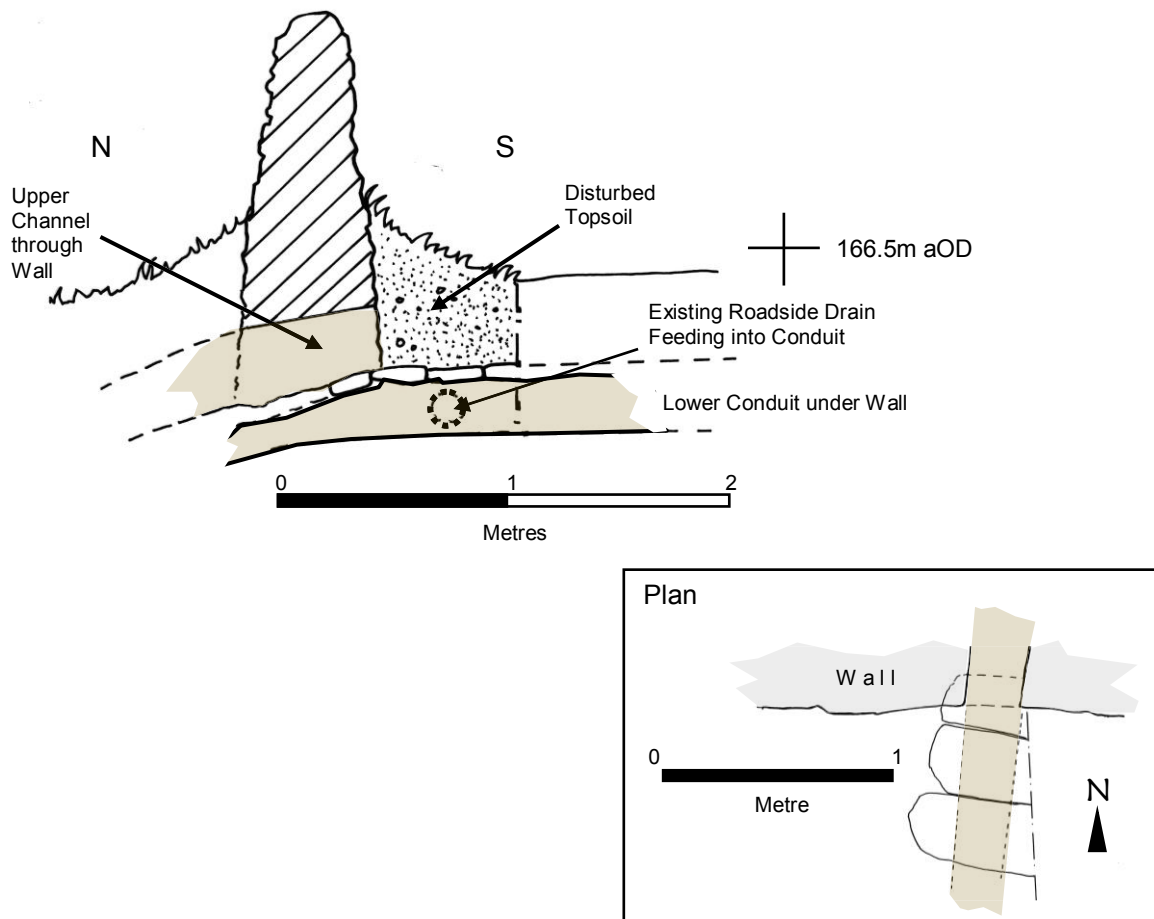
Chamber (D) at the eastern end of the drainage run. Section (top) and inset plan showing stone slabs covering conduit and projected line of conduit, below, in tone.
